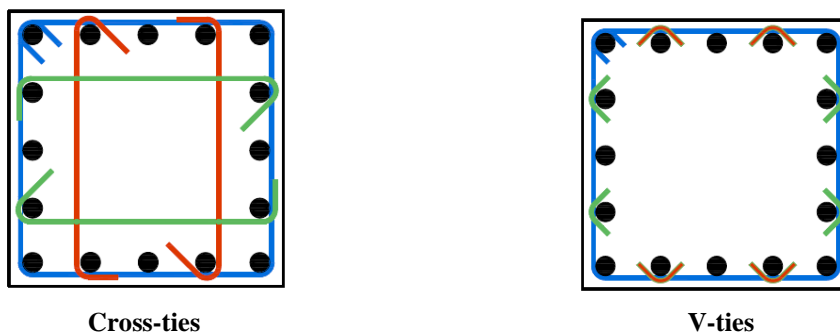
Details of transverse reinforcement for columns with cross-section (500 *500 mm).
